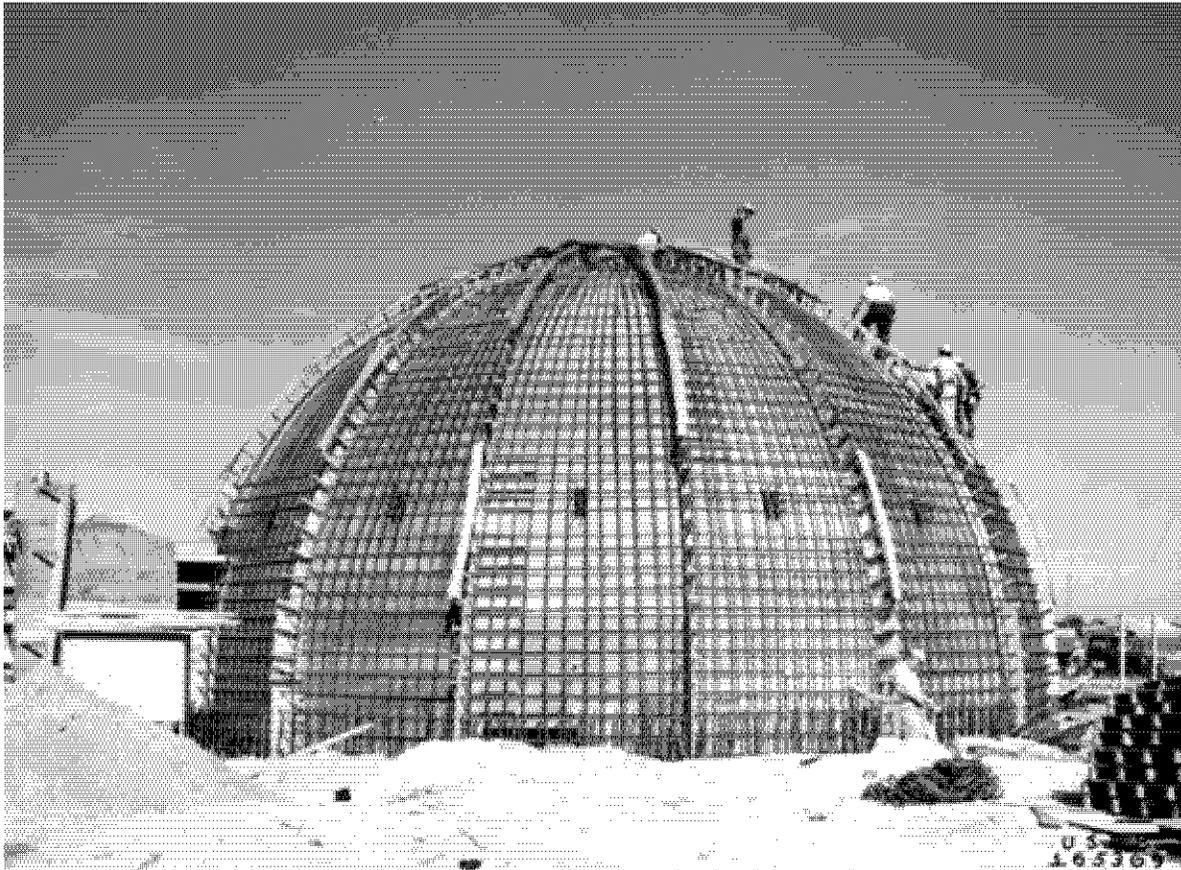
Reinforcing rods being put in place on Blockhouse 31,
